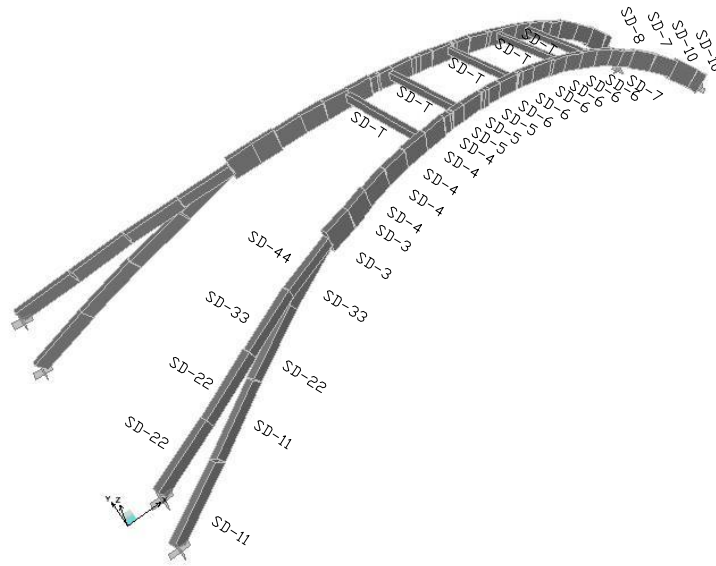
Section of the arch of the footbridge over Crescent Lake.
